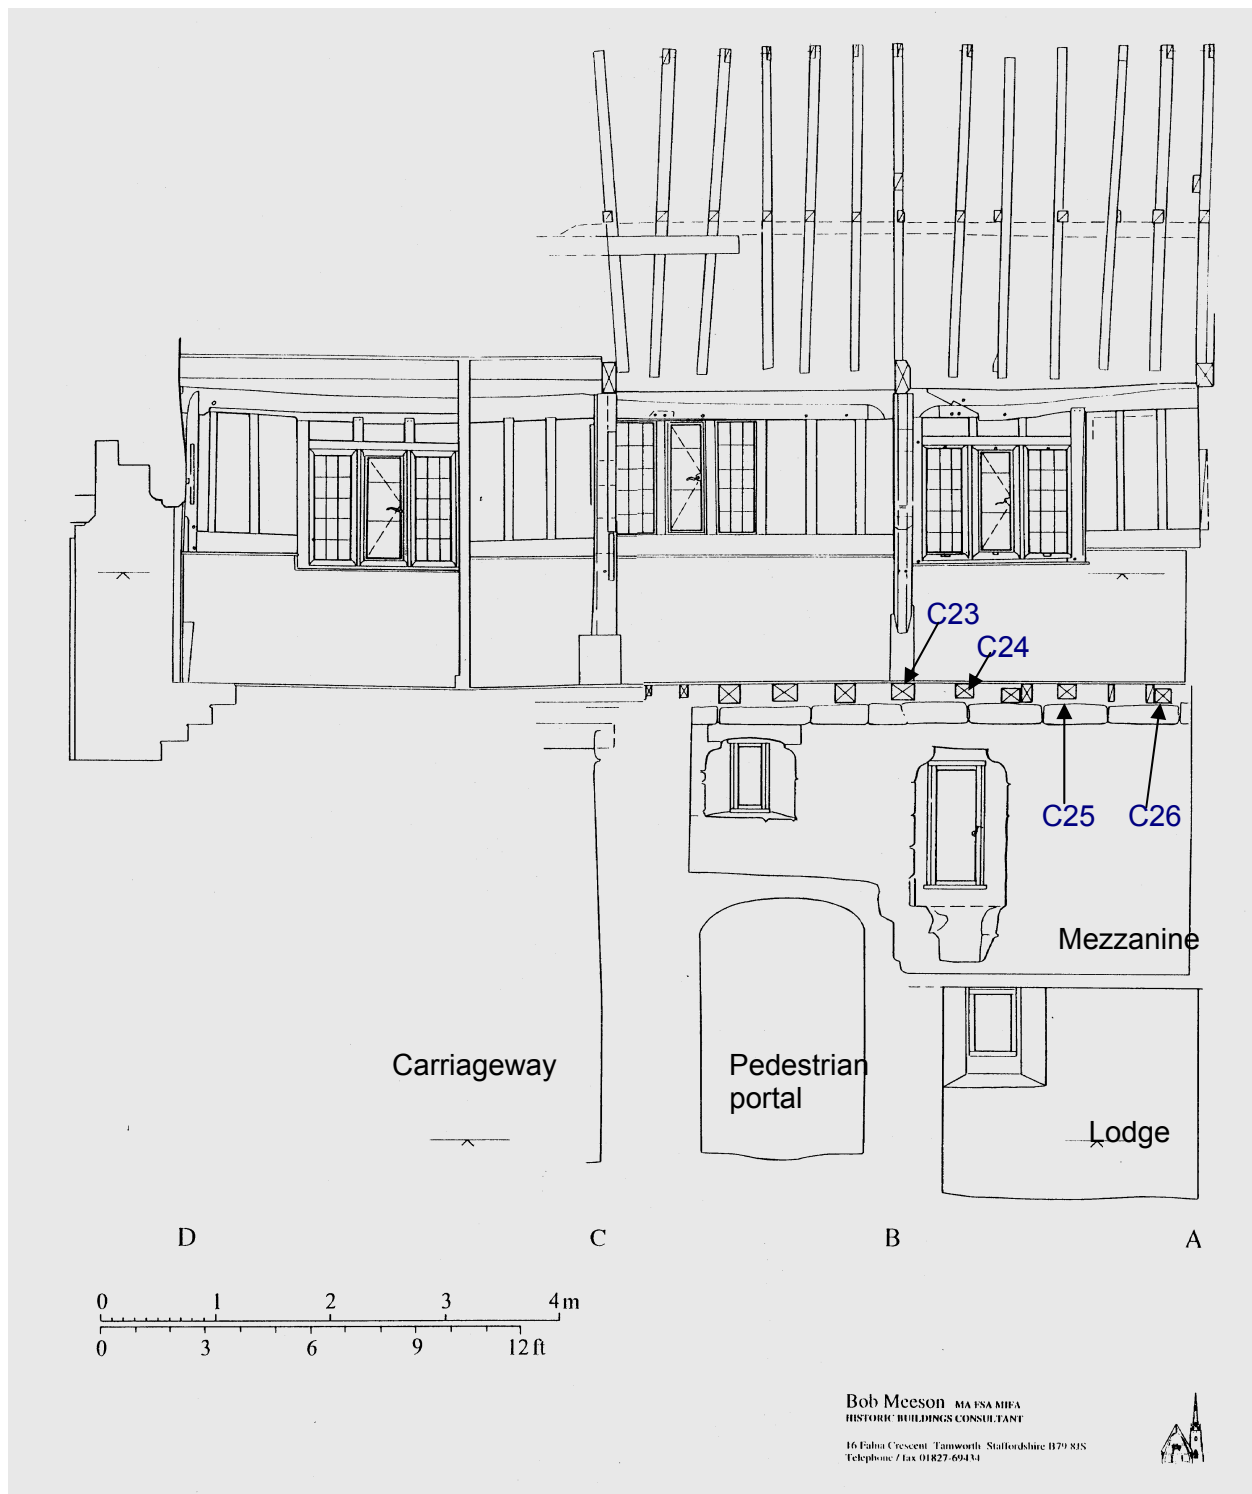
Gatehouse; drawing to show sample locations from the mezzanine ceiling (viewed looking north) (after Jean and Bob Meeson)
